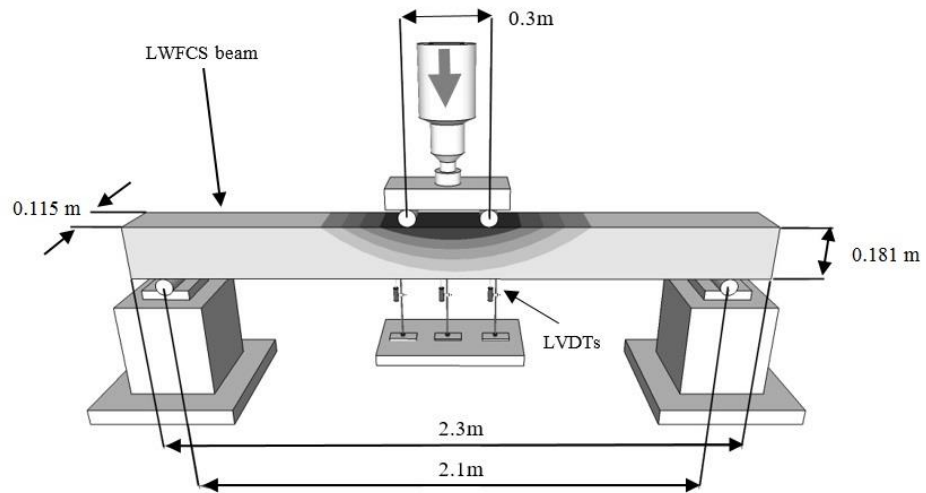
Installation of reinforced LWFC beam on the 4-points bending test machine
